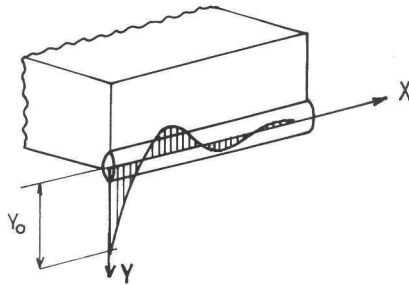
Dowel considered as a beam on an elastic foundation
